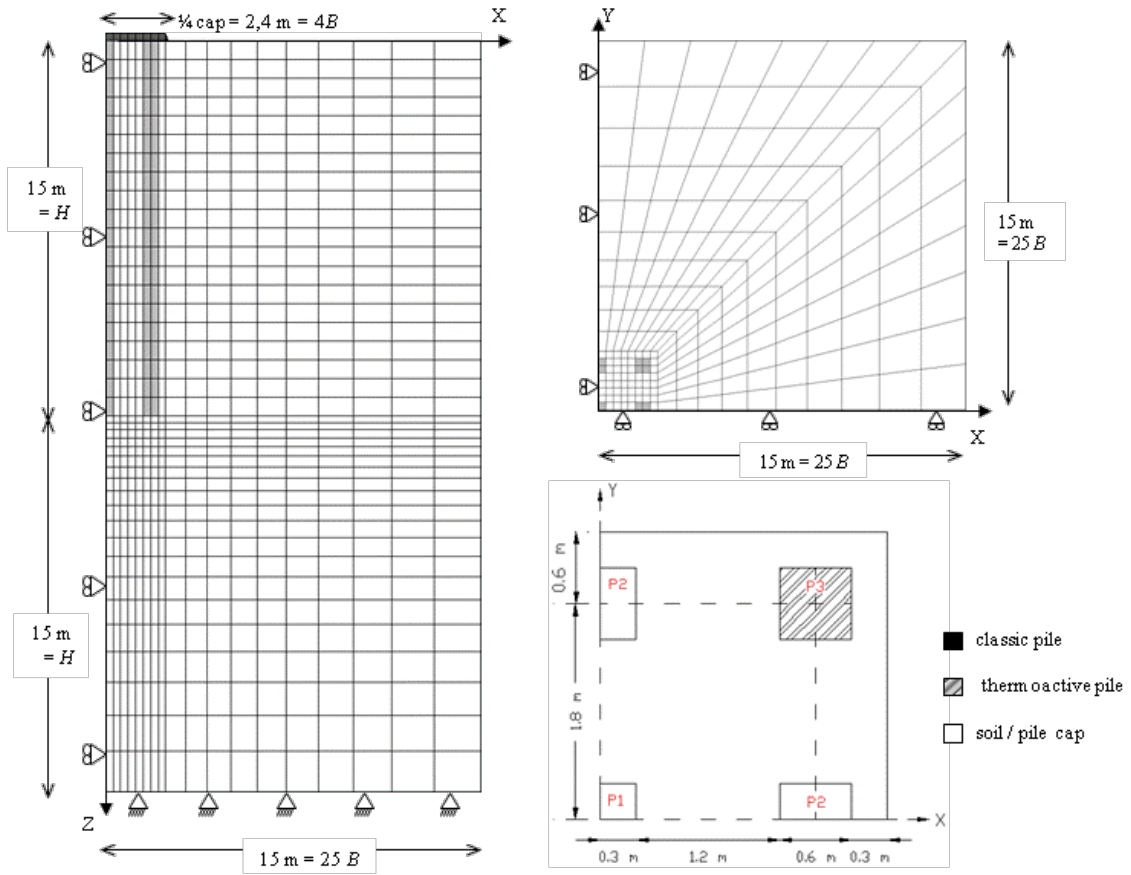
Numerical domain of a 3x3 piled raft foundation
